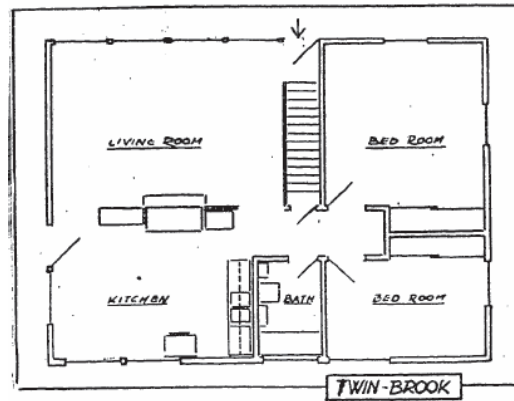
(b), Typical Twinbrook floor plan offered in 1949 (“Twinbrook Plans 520 More Homes,” *The Washington Post*, August 14, 1949, p. R3)
